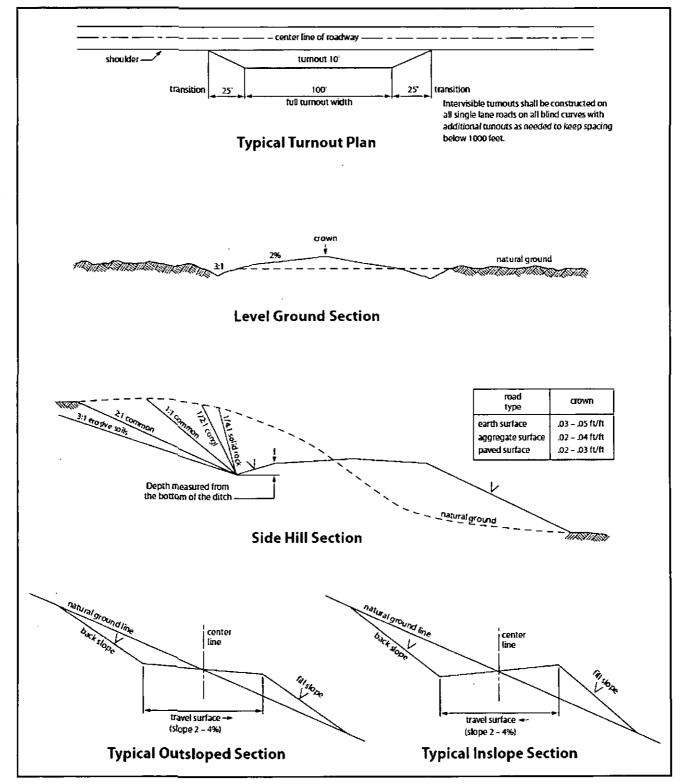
Cross-sections and plans for typical road sections representative of BLM resource or FS local and higher-class roads.
